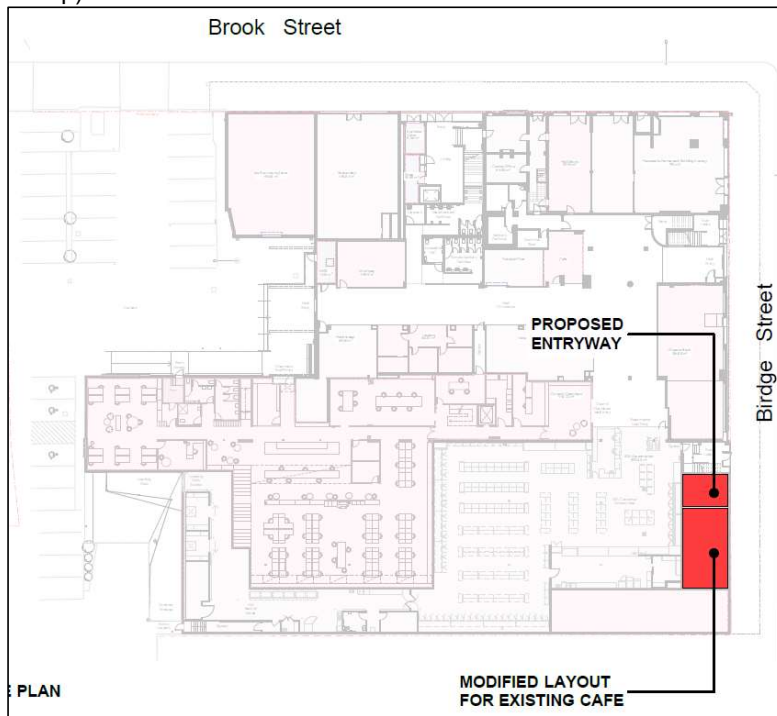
Proposed Floor Layout – Proposed New Entry & Modified Existing Cafe (Source: A&H Eco Group)
